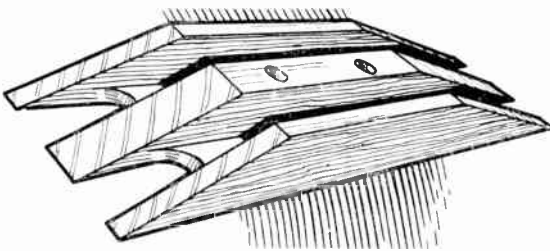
A BRIDGE USED FOR THE CROSSING OF CABLES IN THE WOODEN CASING SYSTEM OF WIRING.
